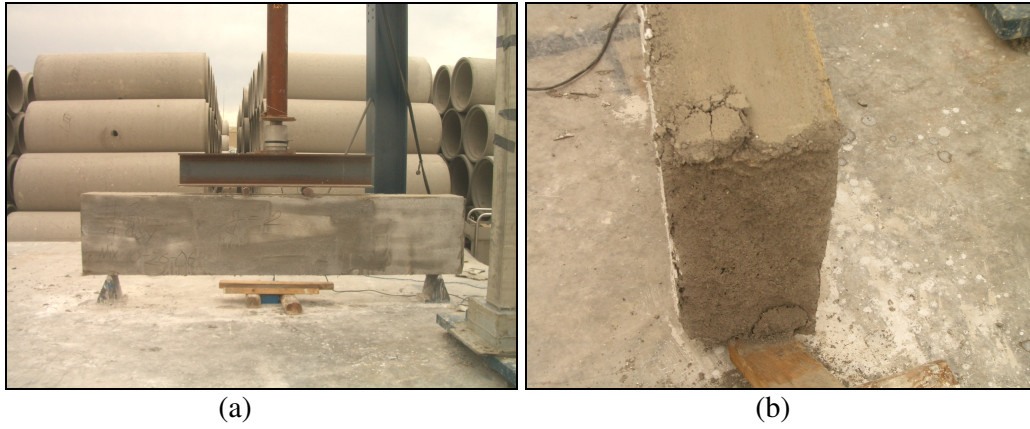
Beam for 2<sup>nd</sup> batch concrete cast on 10/26/06 for 3 day test;
